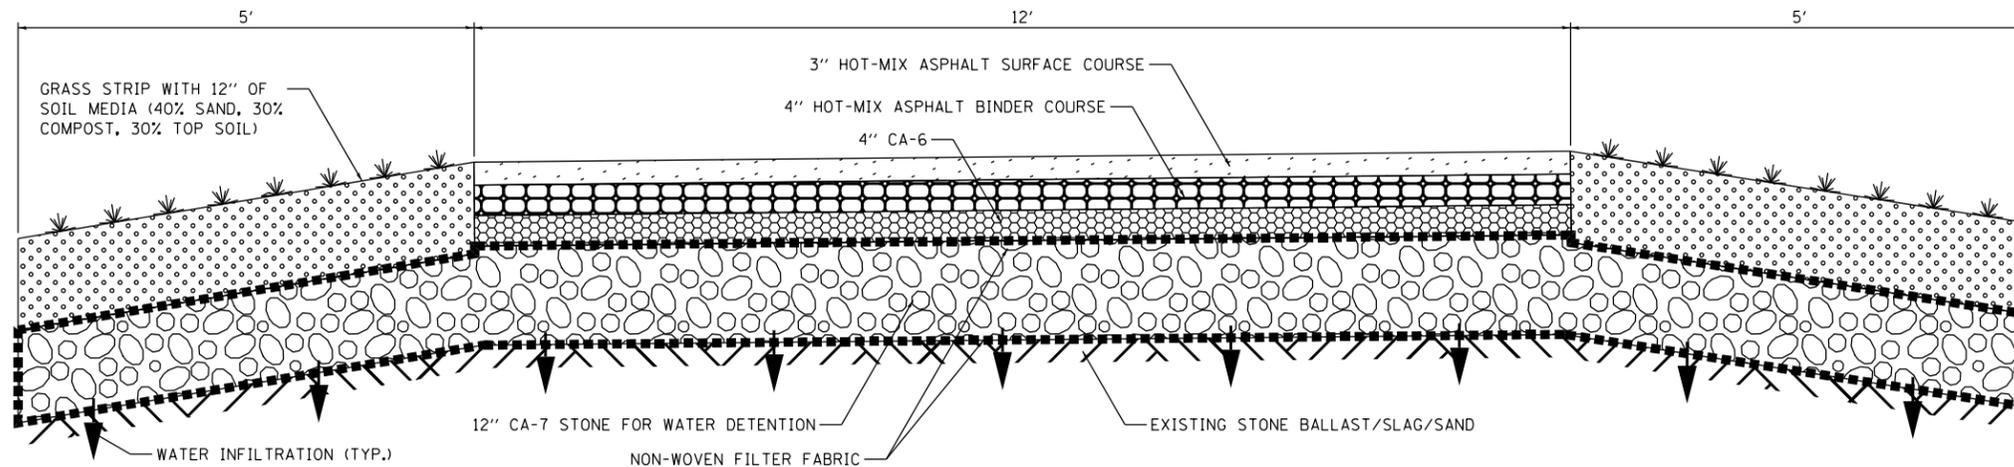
PROPOSED DRAINAGE PLAN
